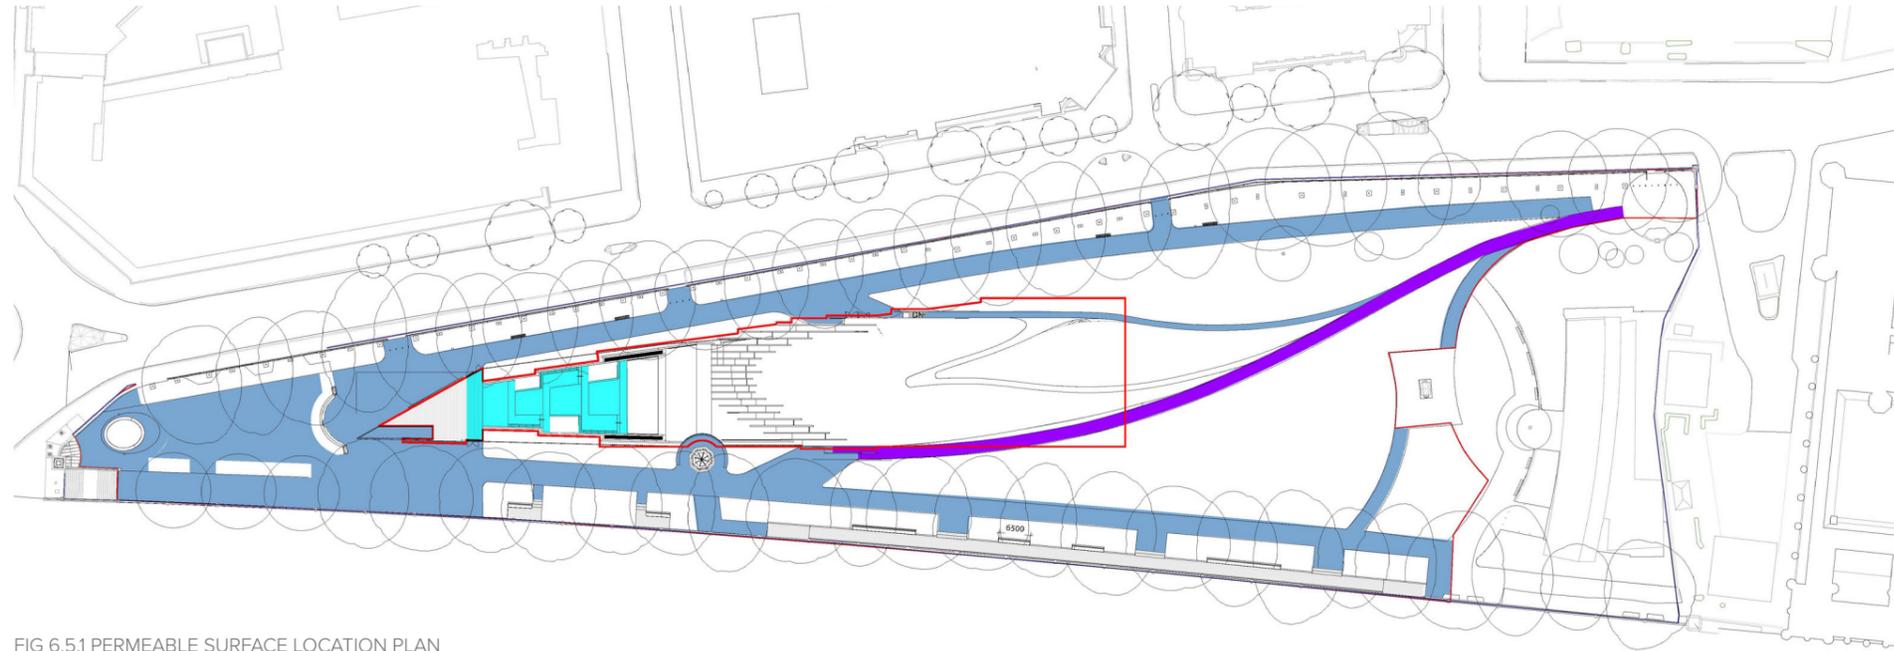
PERMEABLE SURFACE LOCATION PLAN
